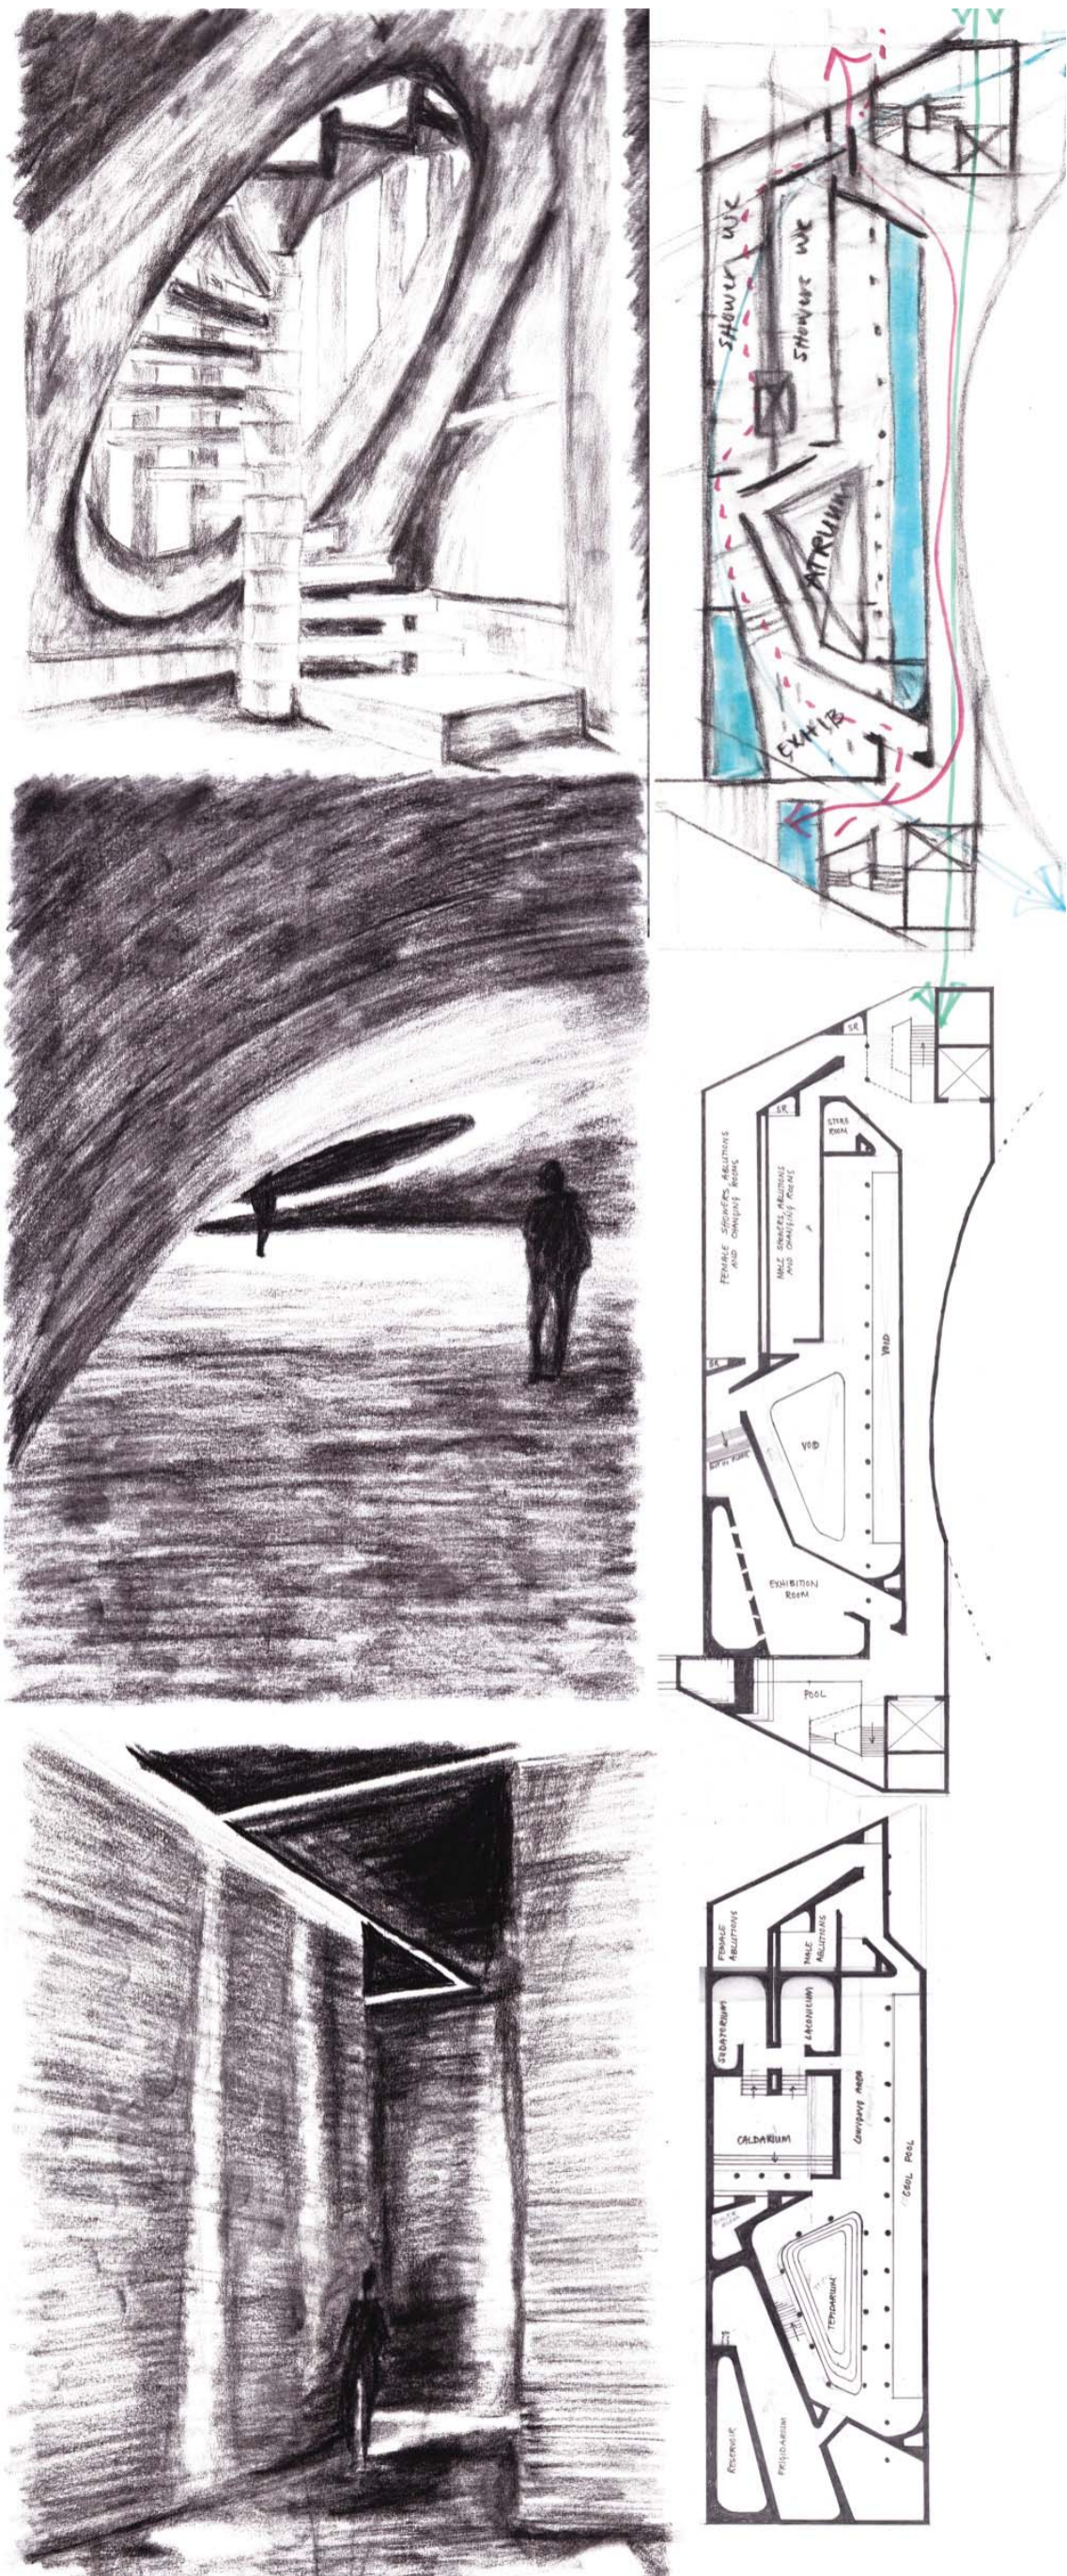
Spatial inspiration drawing and concept underground bath house plans.psd
